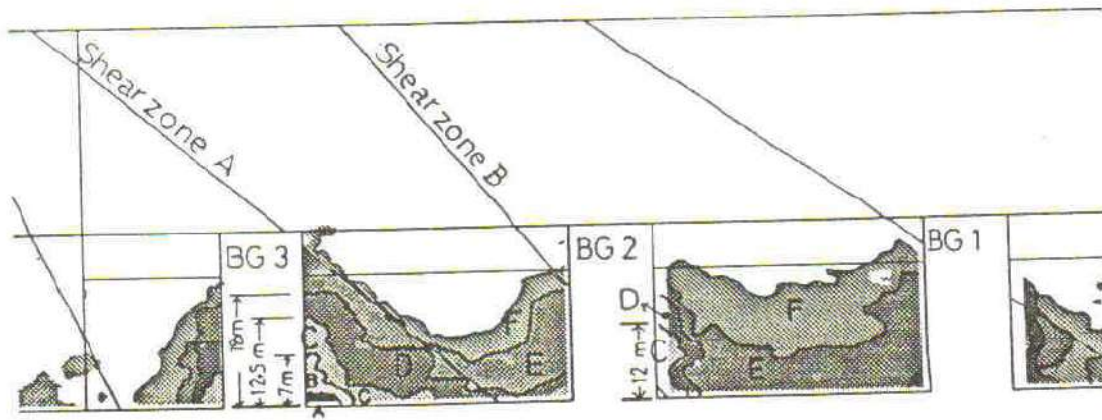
Tensile zones on downstream side in plan section at EL 18
